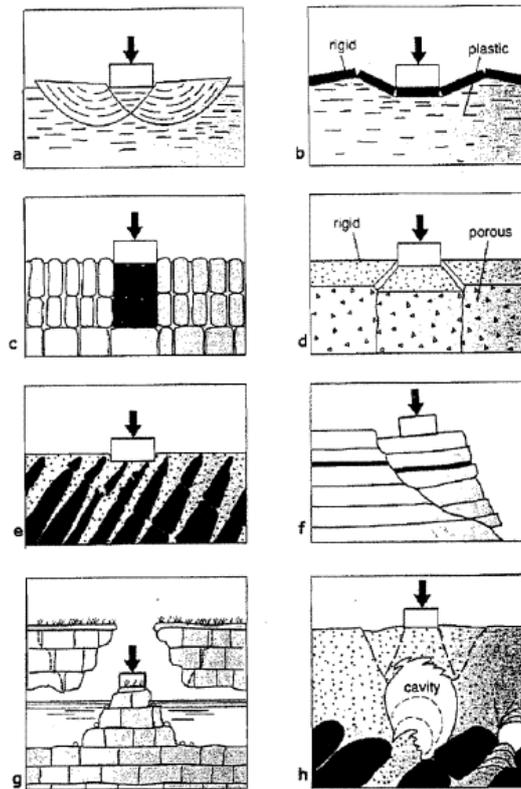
Mechanisms of foundation failure (from Franklin and Dusseault, 1989; adapted from Sowers, 1976): a) Prandtl-type shearing in weak rock; b) shearing with superimposed brittle crust; c) compression of weathered joints; d) compression and punching of porous rock underlying a rigid crust; e) breaking of pinnacles from a weathered rock surface; f) slope failure caused by superimposed loading; g) collapse of a shallow cave; and h) sinkhole caused by soil erosion into solution cavities.
